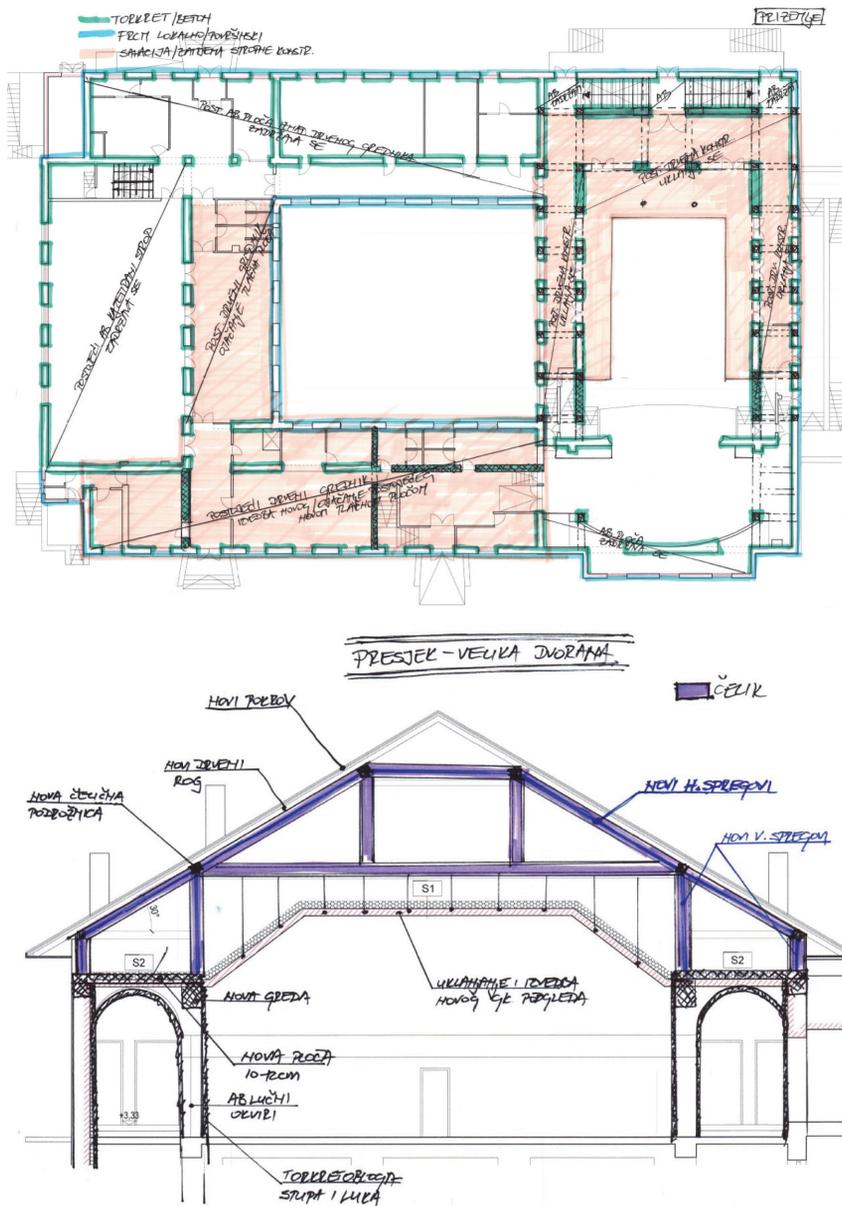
Sketches of concept solutions for structural reinforcement [3]
